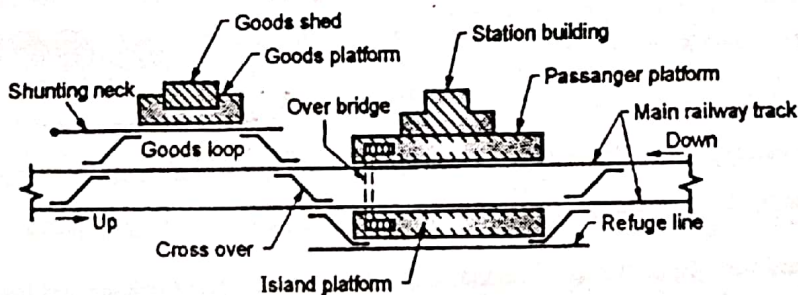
Layout of crossing type wayside station on a single line track
